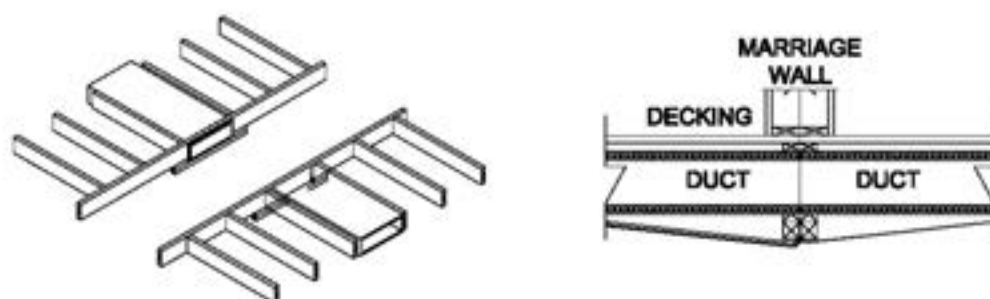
In-floor duct connection through the rim joist without metal sleeve
